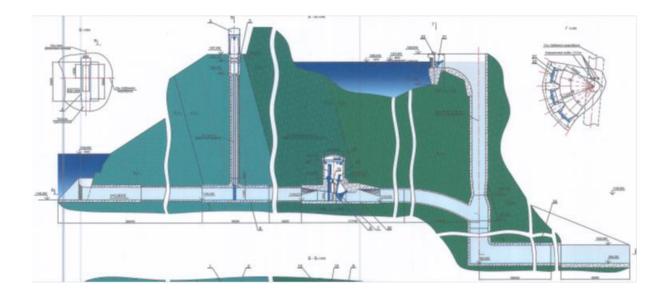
Remote spillway and Operation shaft spillway - longitudinal section
